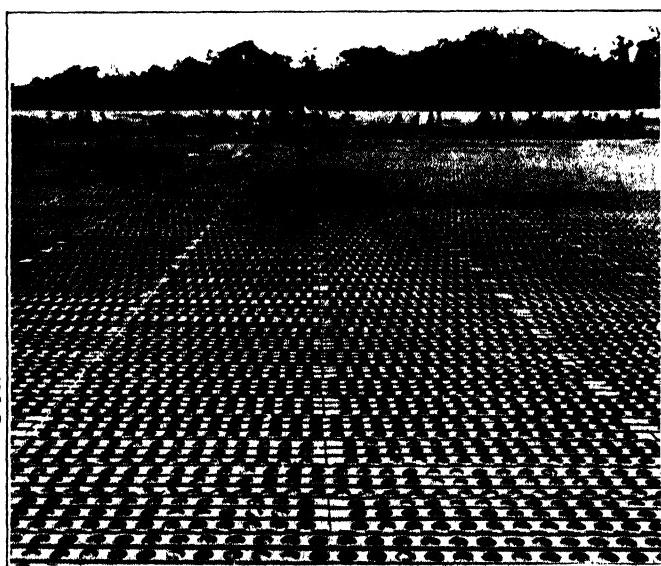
Strip of Irving airfield mat used as roadway—partly filled with sand.
